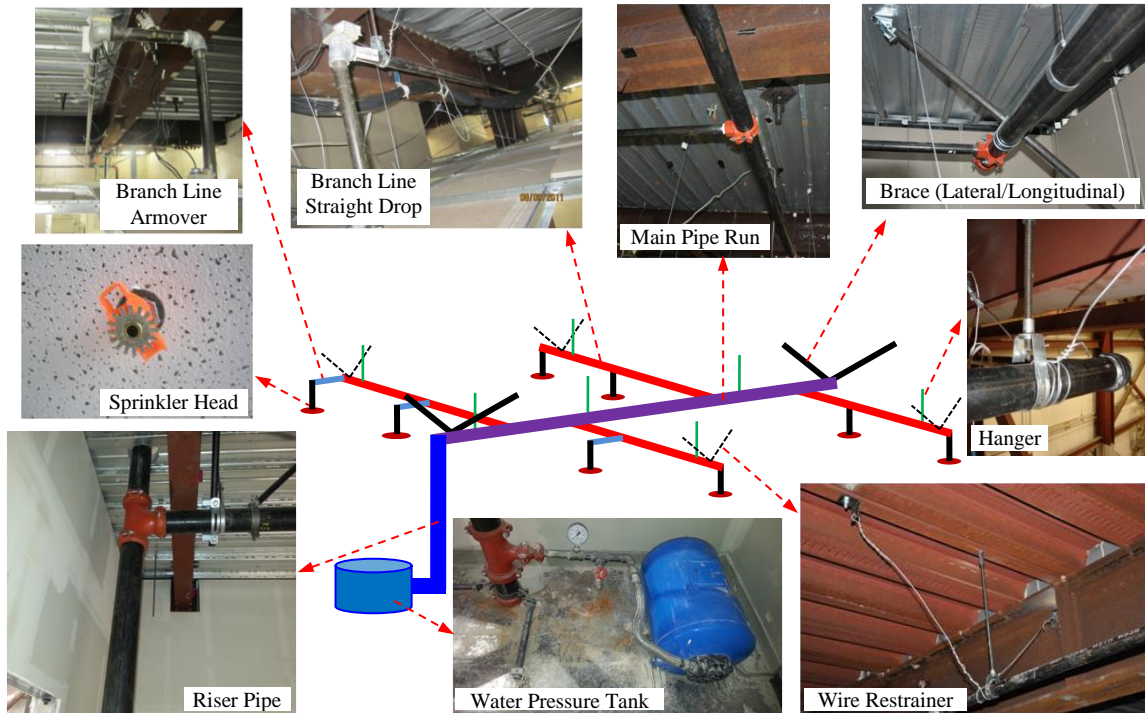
Fire Sprinkler Piping System Schematic [Figure courtesy of Soroushian et al., 2014b]
